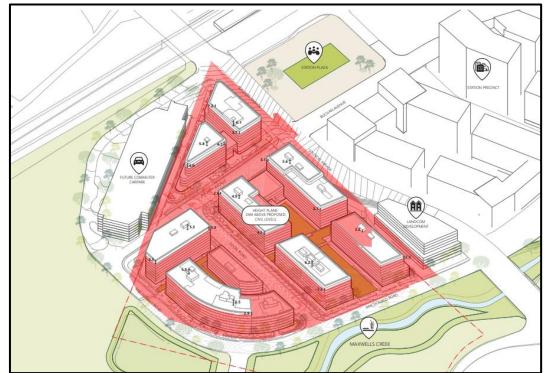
Extract of height plane diagram of the proposed scheme, demonstrating the maximum height deviation of 6.5m at Building G (stage 4) from the 24m height control
